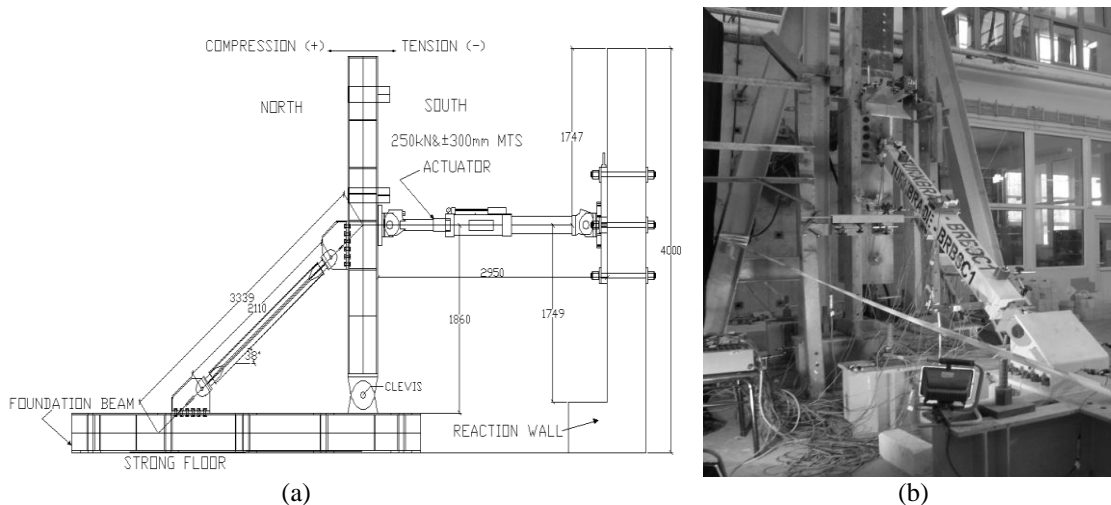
Test set-up (a) general view (b) instrumentation for specimen.
